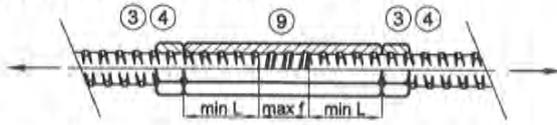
Coupler, standard; thread coupler Ø18 - 43
